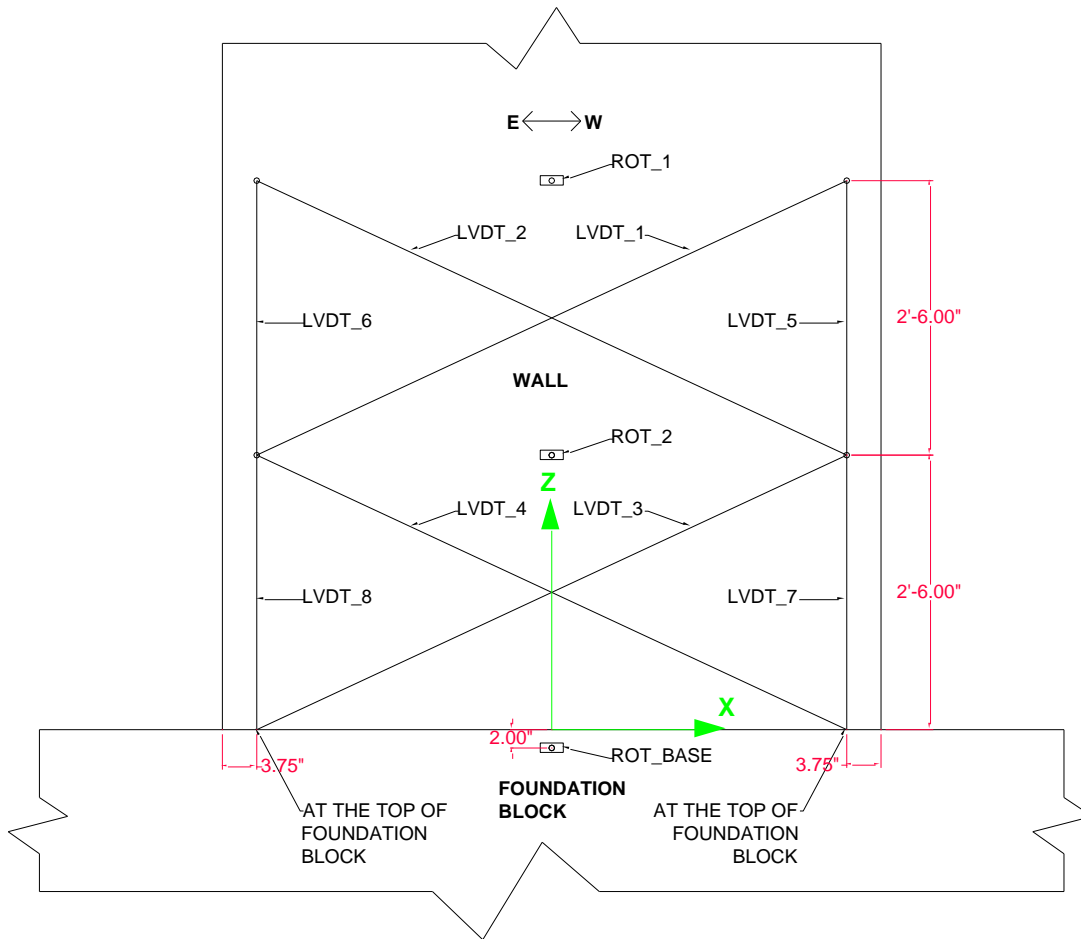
LVDTs and rotation meters on Wall 2 and Wall 3
